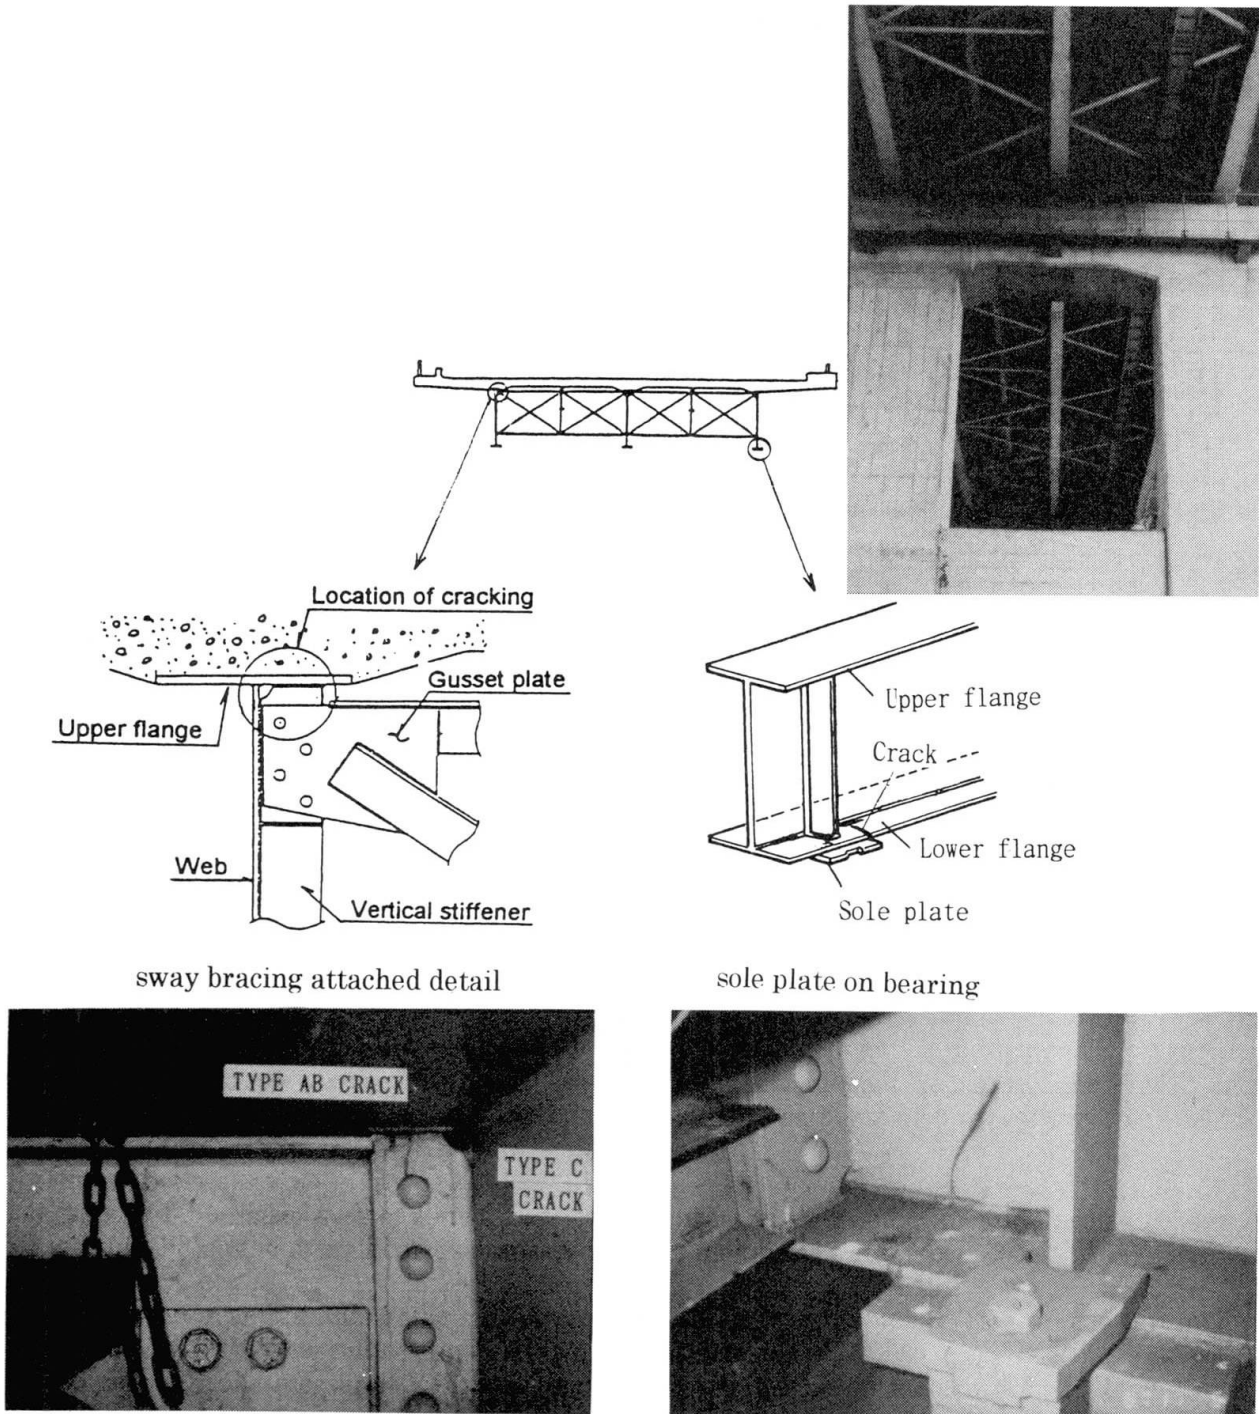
Typical fatigue damage in plate girder bridge
